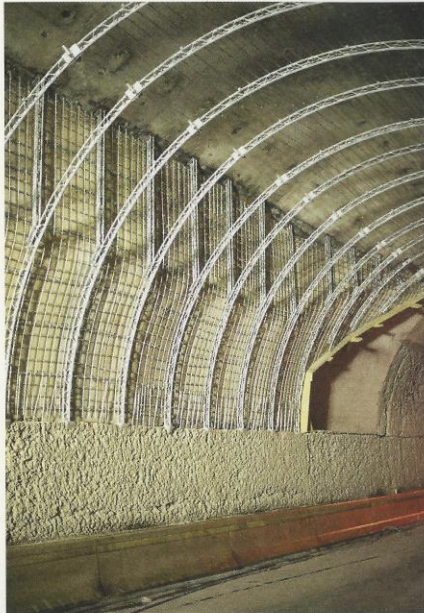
(left and above): Construction sequence Step 3—lattice girder and extrados reinforcement sidewall sections
